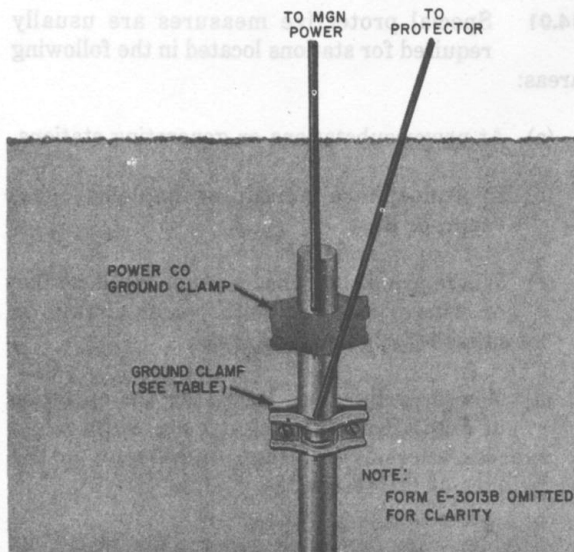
MGN Power Grounded to Ground Rod—No Water Pipe or Connection to Pipe Not Possible
